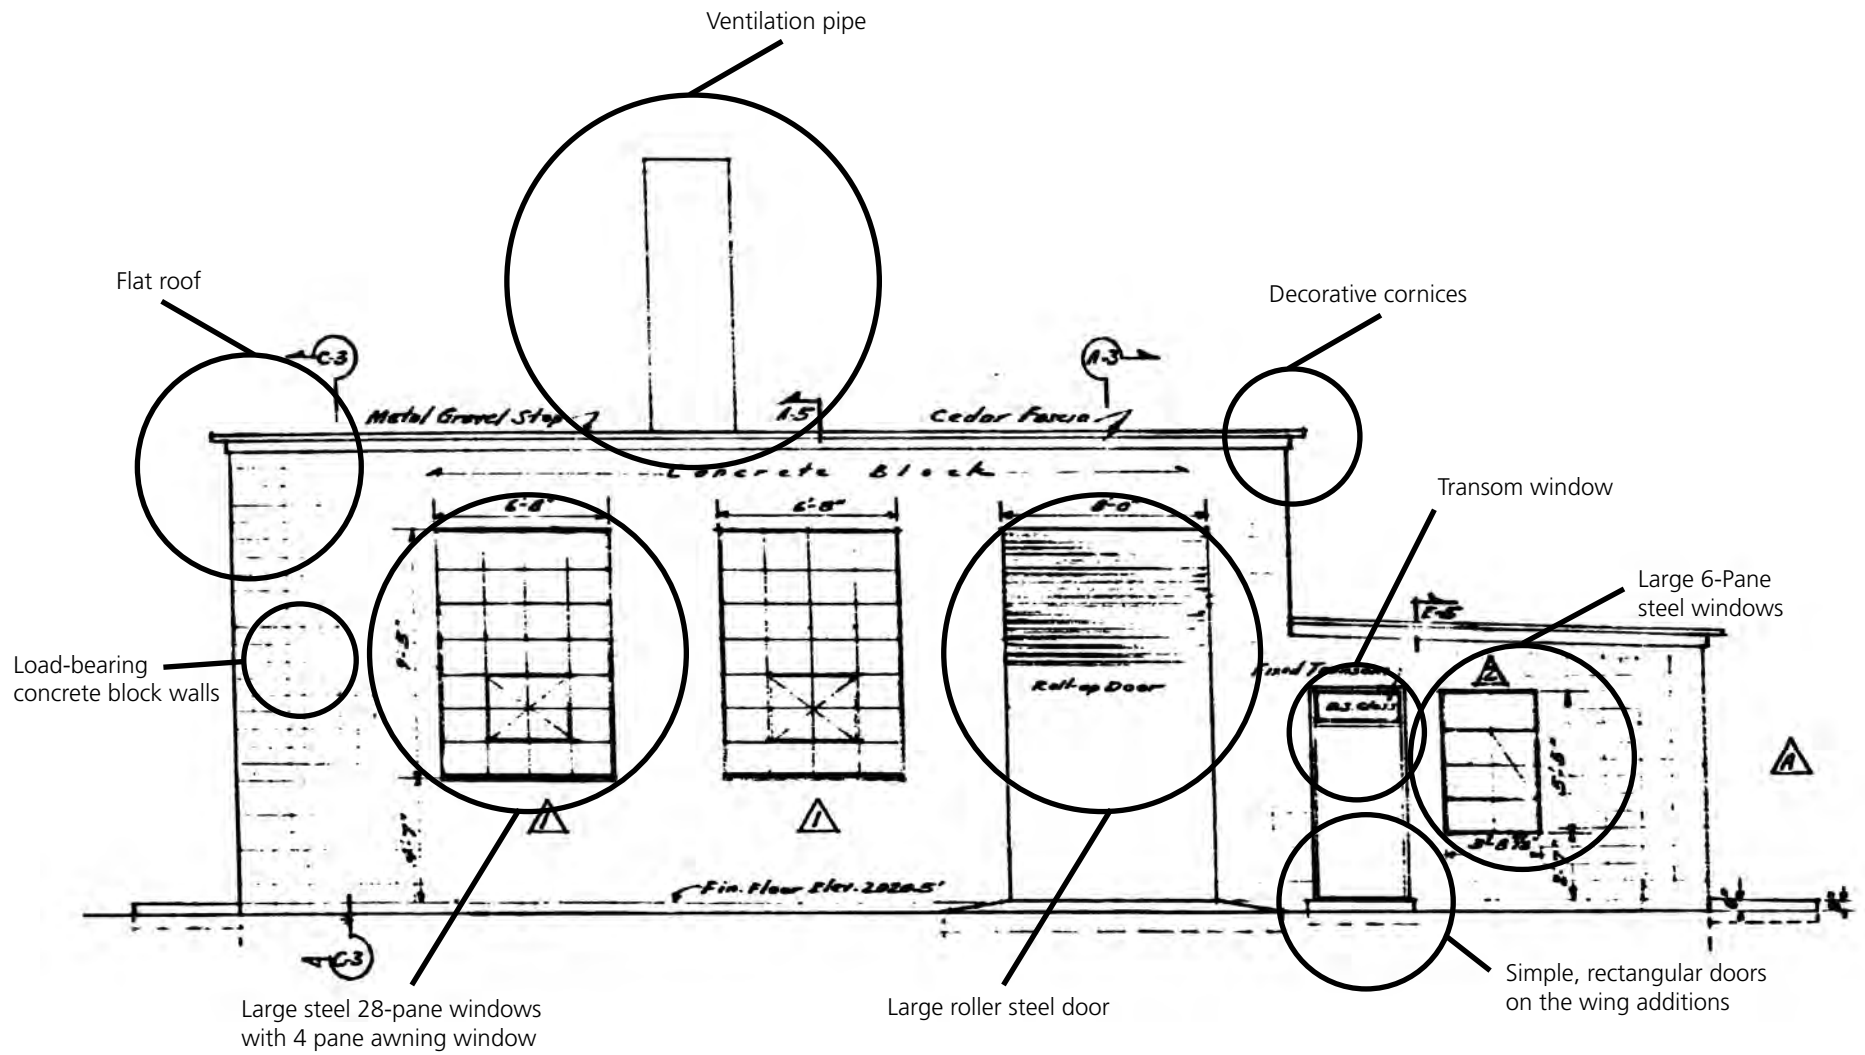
Building 54, North Elevation, As-Constructed Drawings, 1961, AKRO Files
